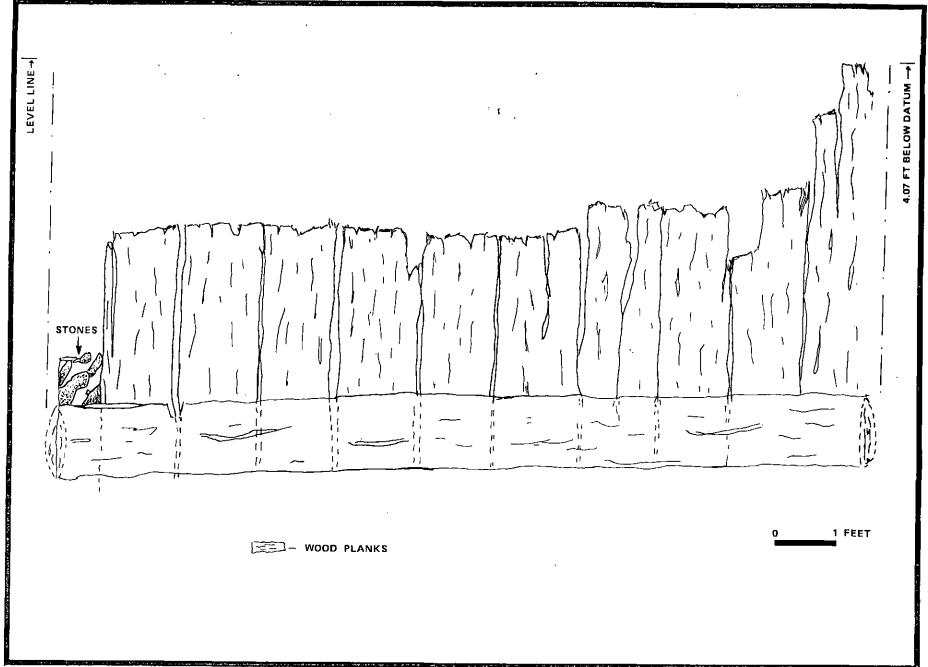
Vertical Plank Bulkhead in Test Trench West, Looking North.
